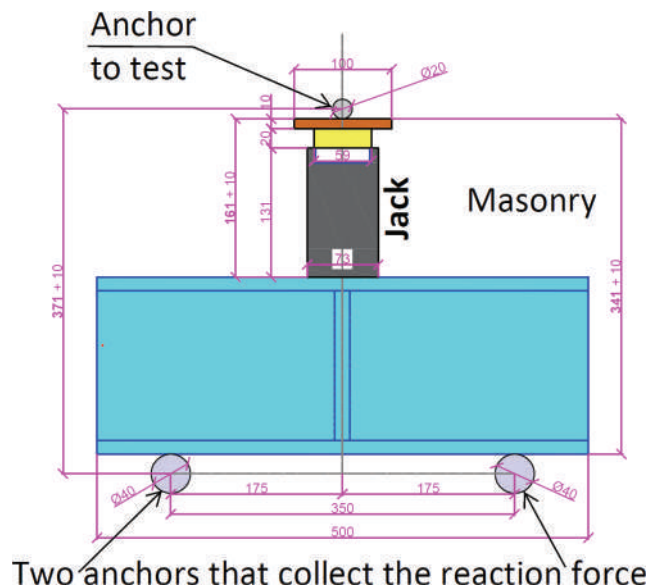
Shear strength test set-up applied to the anchor having $\Omega = 20$ mm and $L - e = 300$ mm: frontal view. The jack pushes the steel bar (transverse to the tested anchor), which in its turn pushes the anchor's segment that protrudes from the masonry surface. The I-section steel beam that supports the jack is simply supported by the two lower anchors and is stiffened by a plate welded at the midspan. It is to note that the test set-up applies the force from downwards.
